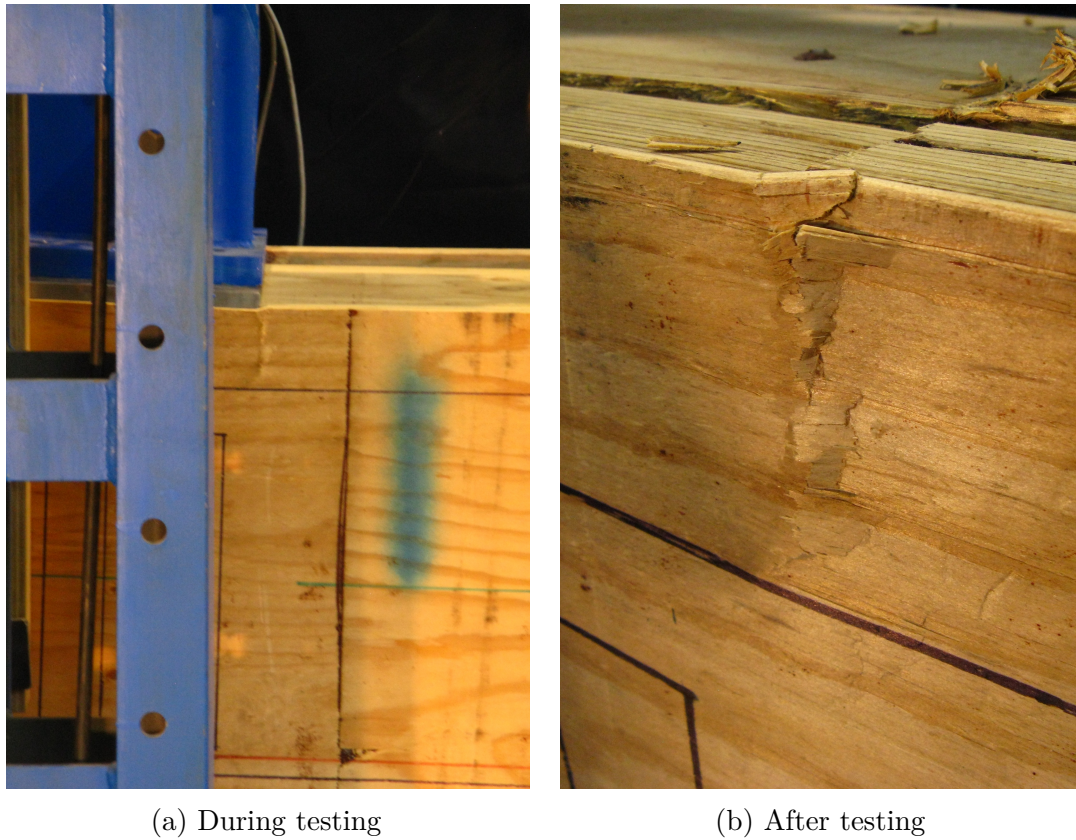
Close-up of compression failure in top flange of Beam 3 - Draped PT
